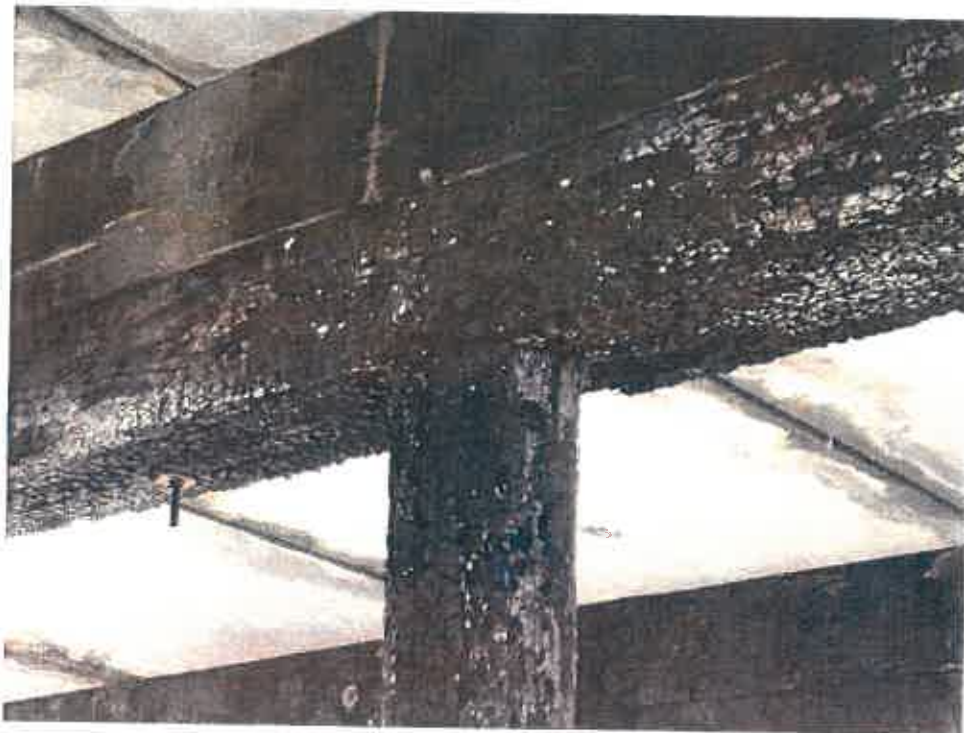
Typical Failure of Lower Pile Cap and Punching Action of Pile
